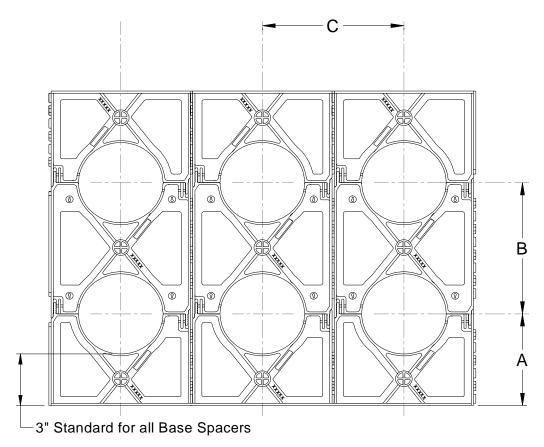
FIGURE A - PLAN VIEW TYPICAL DISTRIBUTION CONDUIT CONSTRUCTION DETAILS
